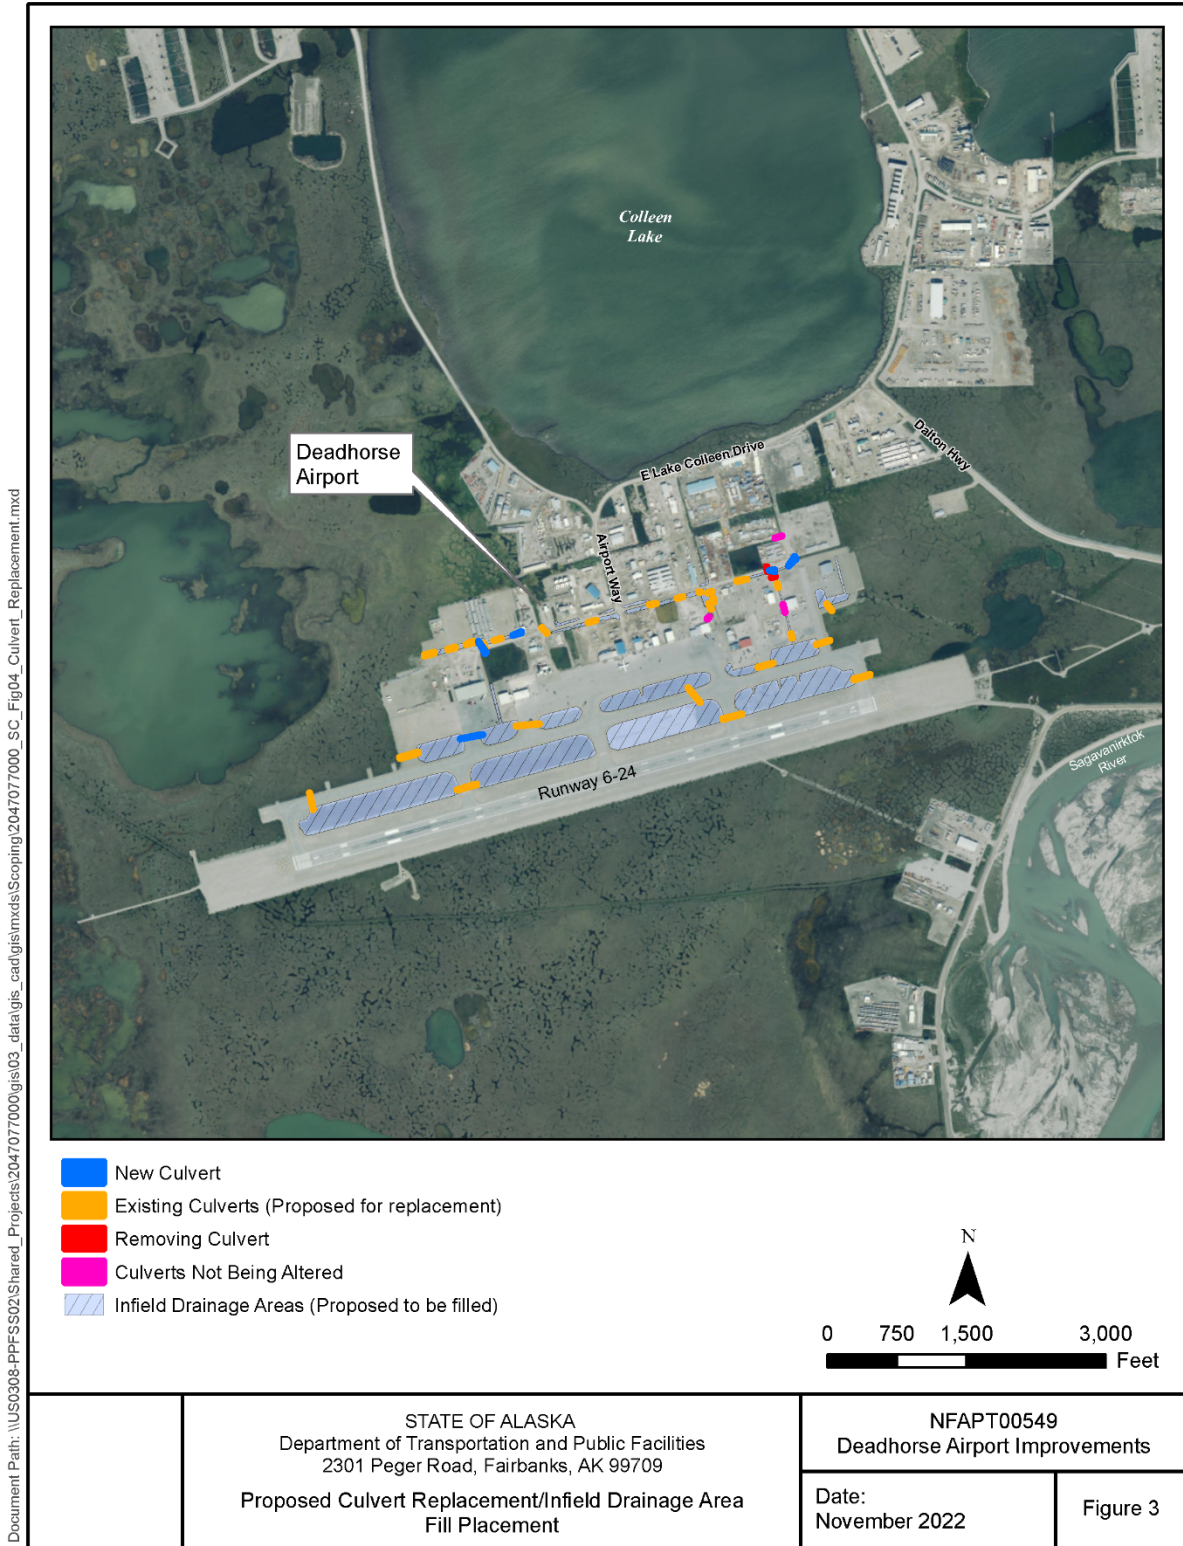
Proposed Culvert Replacement and Infield Drainage Area Fill Placement
